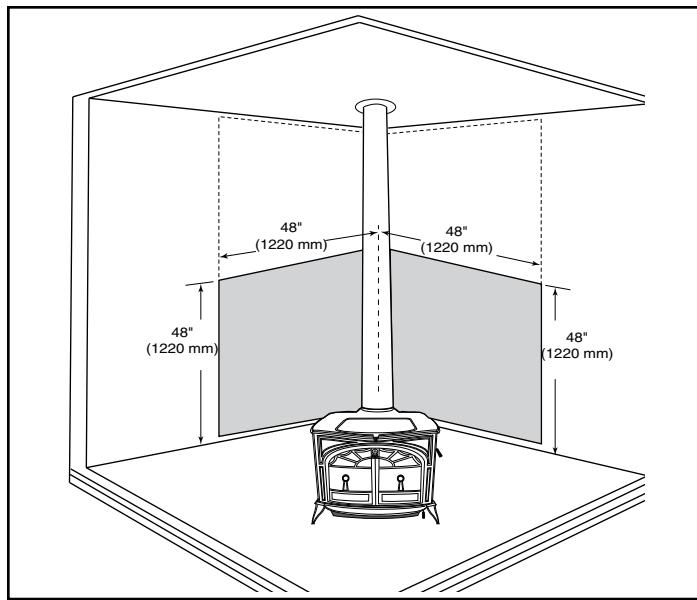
Corner installation, vertical chimney connector, two wall shields. Reduced side clearances. Wall shield MUST meet at corner.
